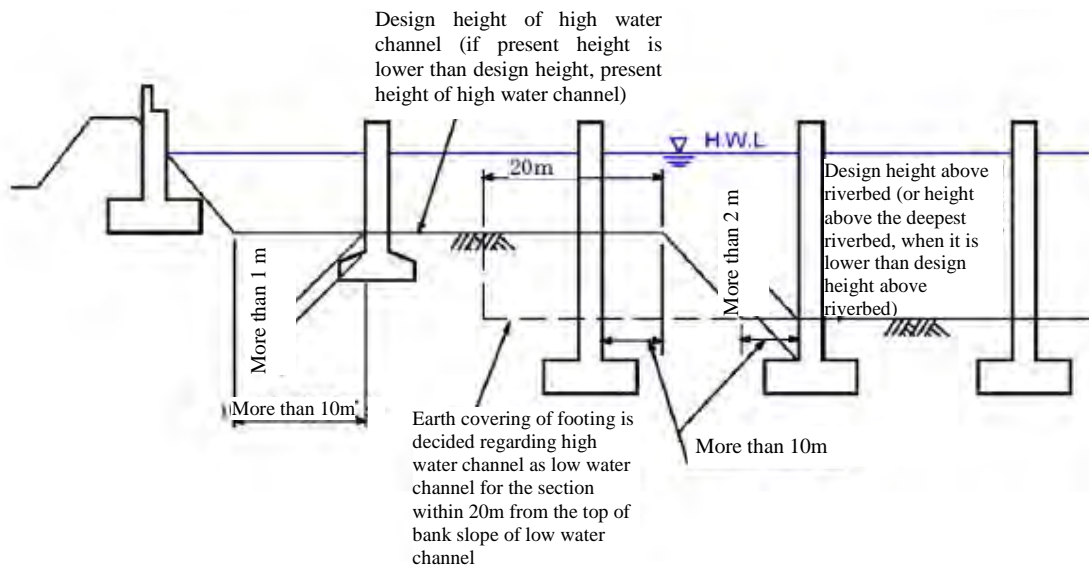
Image of restrictions on position of piers and embedment of foundation of piers
